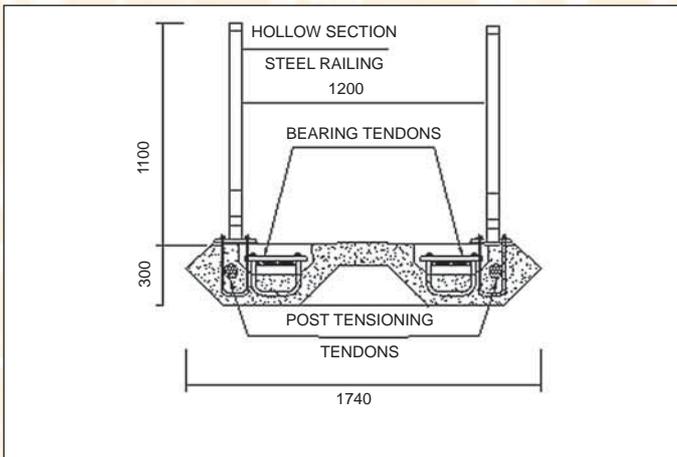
The deck section of the Mkomaas River Pedestrian Bridge
